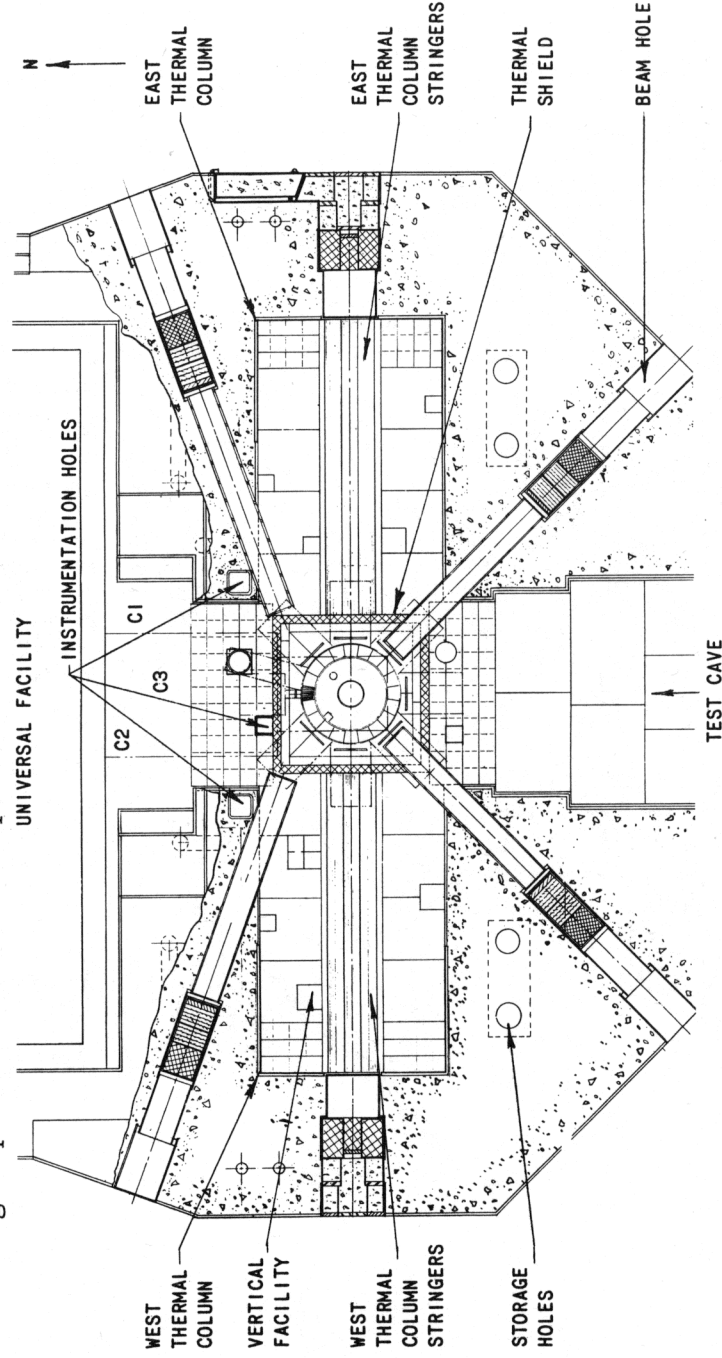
JUGGERNAUT Section at 63.5-cm Elevation
